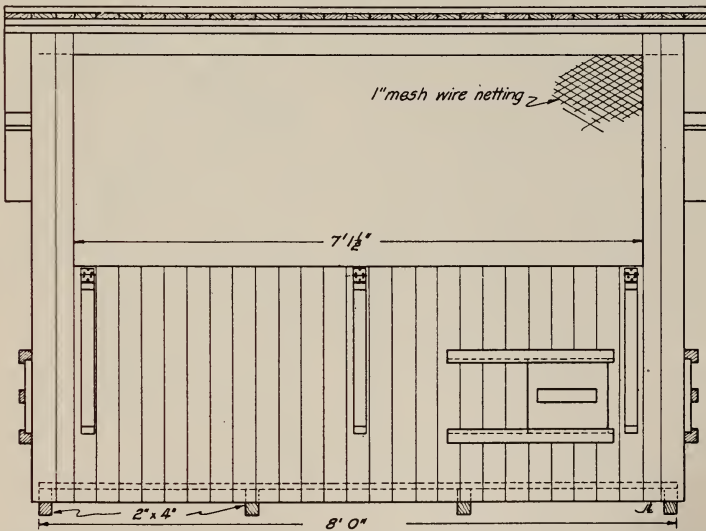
View showing front wall construction of 8 × 8 foot knock-down poultry house. The construction of the curtain is shown in figure 40.
